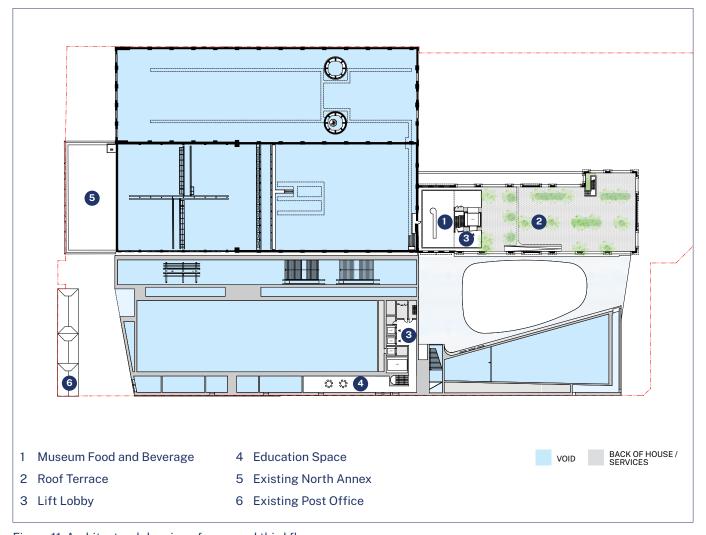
Architectural drawing of proposed third floor of the Powerhouse Museum Ultimo Revitalisation (source: Durbach Block Jaggers and Architectus)
